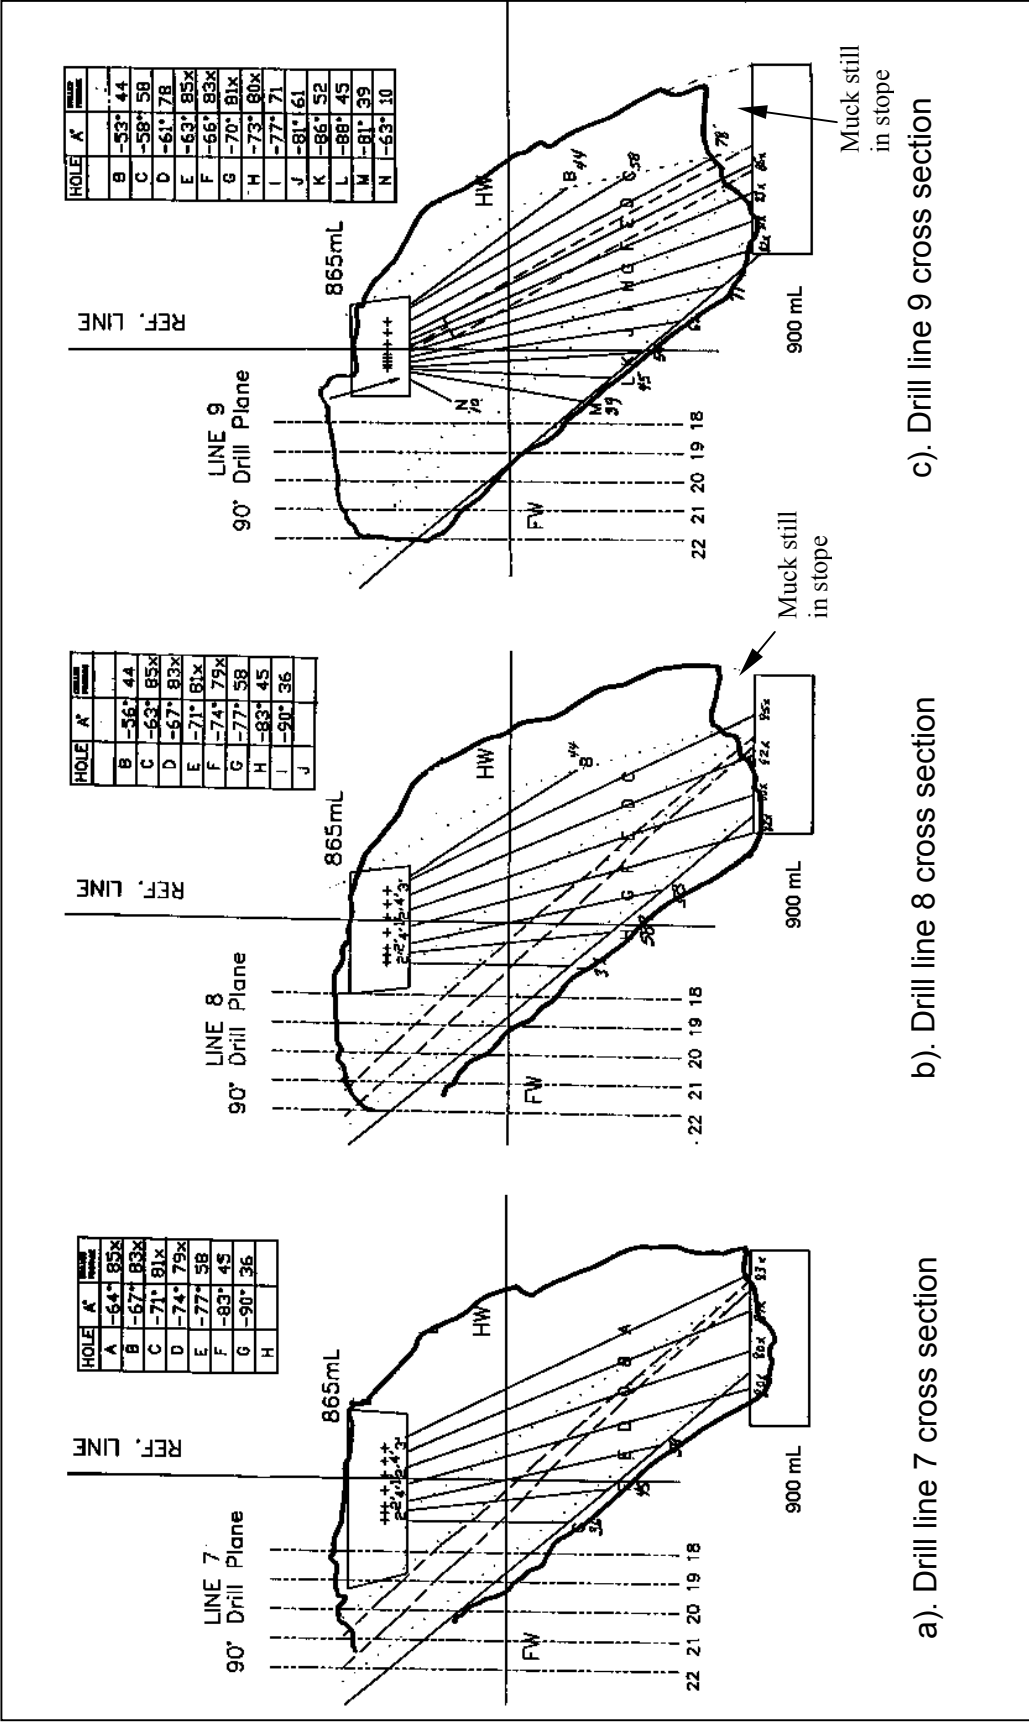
Drilling cross section showing CMS surveyed overbreak profiles and undercutting
